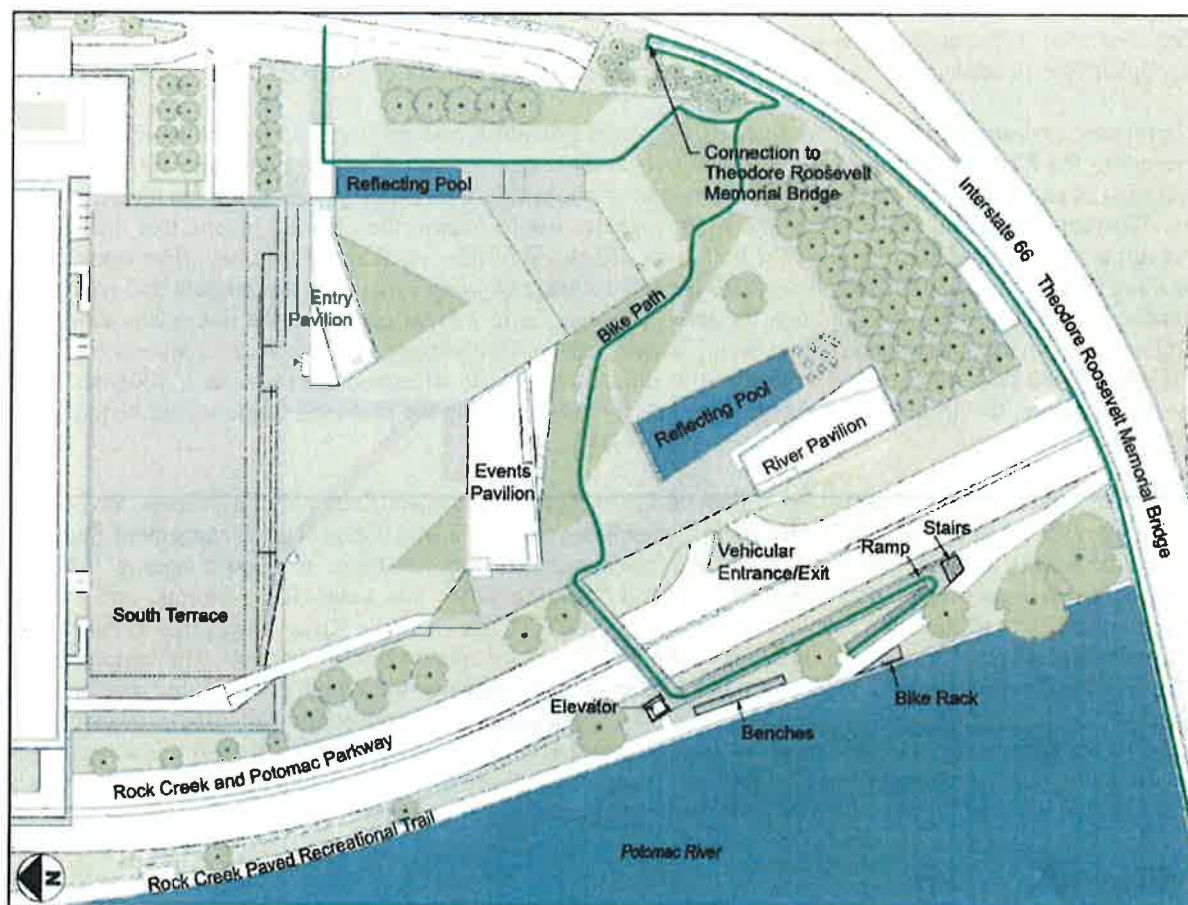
Alternative D - Bridge Access with Elevation and Ramp
